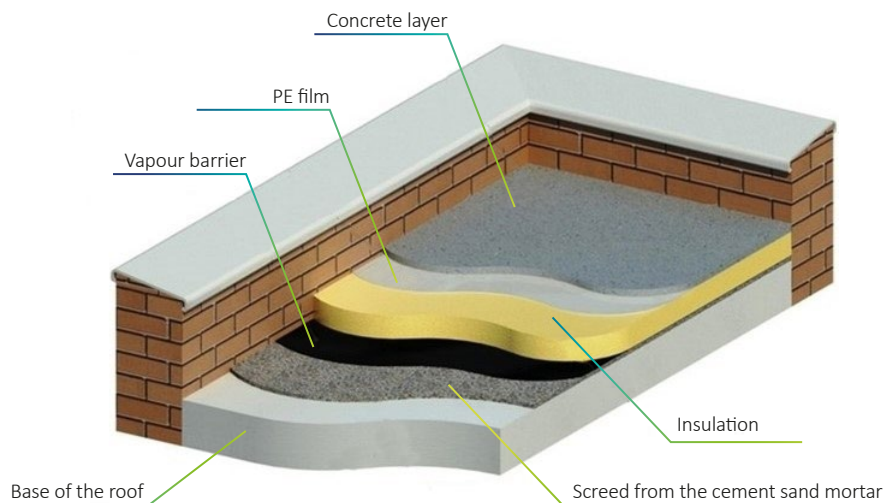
The construction of the flat roof with insulation and waterproofing layer
